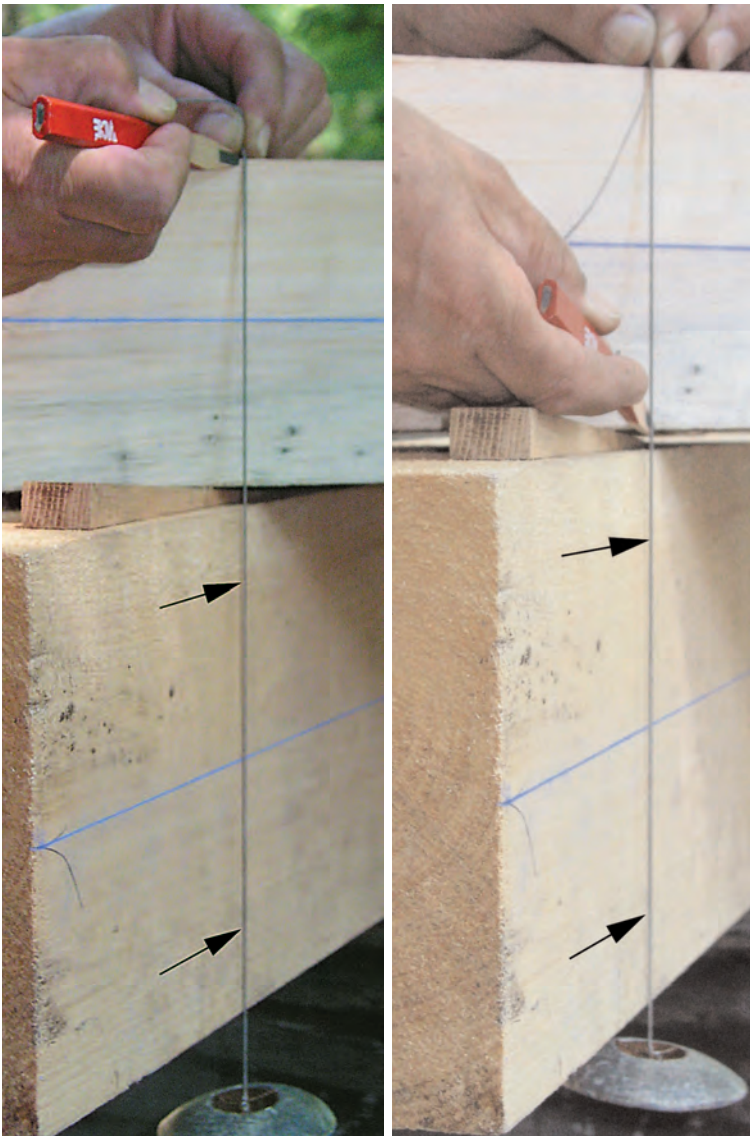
Plumb bob layout for typical brace connection to post or beam.
